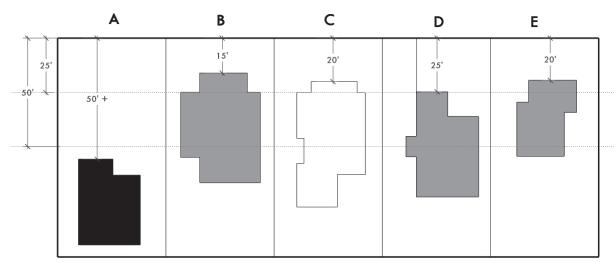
Because of the variety in existing placement of buildings on the same block face, new development or building expansion on the subject property (lot C) may be located with a building placement of 20 feet, which is the average of the placement of lots B, D, and E. The building on lot A is not included in the average because it is located more than 50 feet from the property line.
